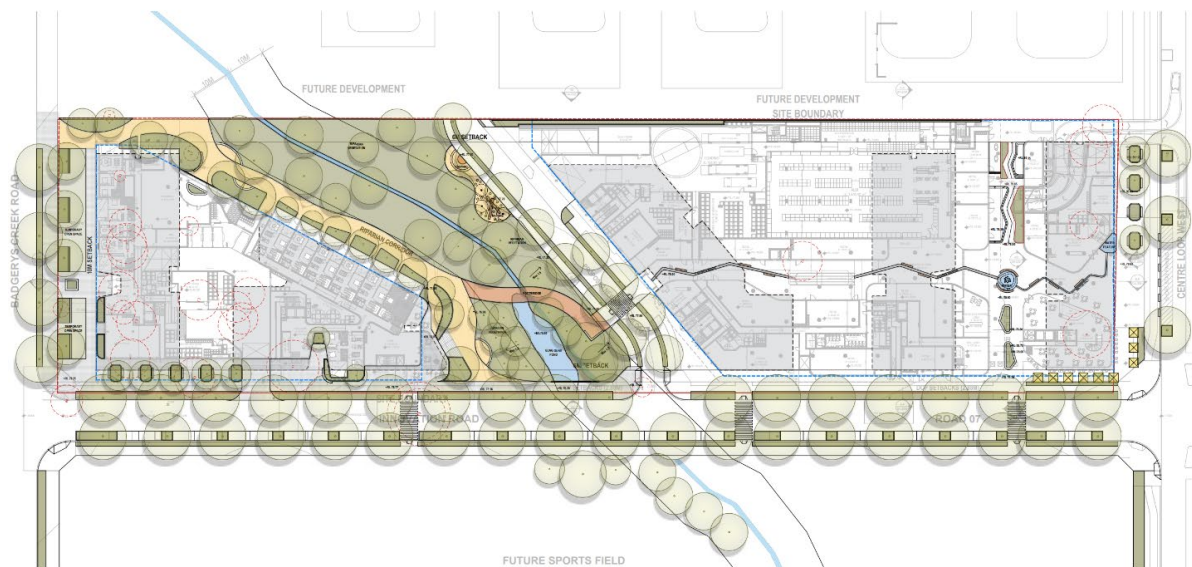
135 Badgerys Creek Road Landscape Master Plan (source: Land and Form Studios, 2025).
